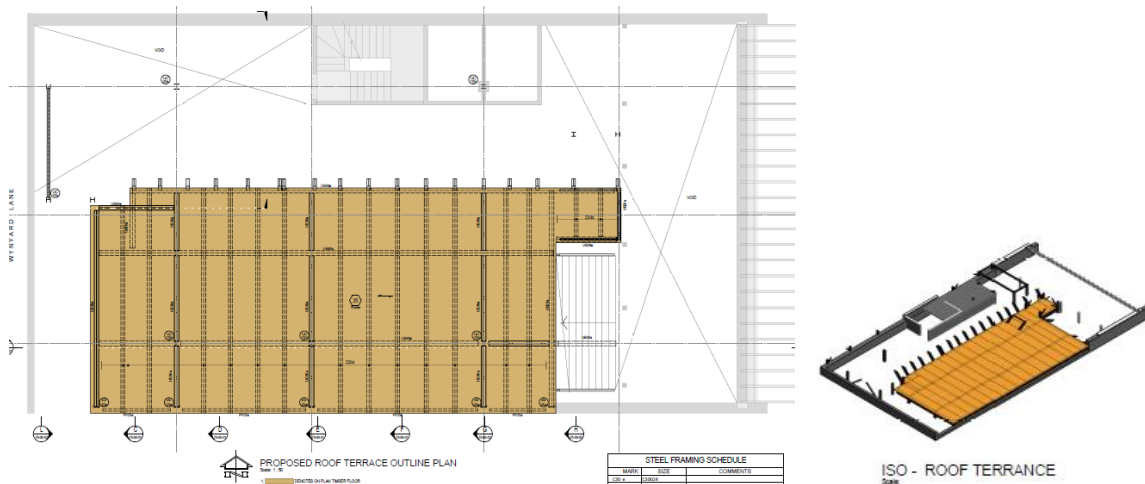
Proposed roof terrace outline plan, steel frame location. (Source: TTW, drawing number ST-285- 60-00-60, November 2018)
